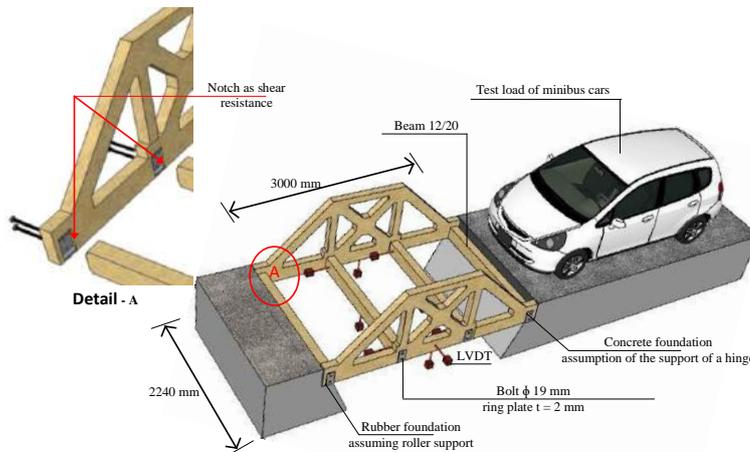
Arrangement of the testing of the bamboo reinforced concrete frame precast bridges.
